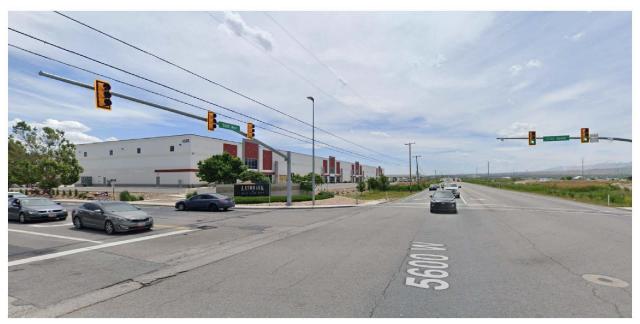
View of the building on 5575 W from the intersection between 1730 S and 5600 W
